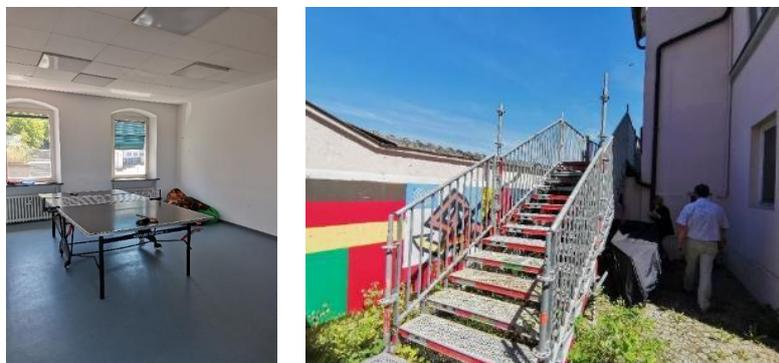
A photo showing an interior room that is used to play table tennis and a photo showing the lack of outdoor space next to the building due to the fire escape that was added recently (2021/22).
